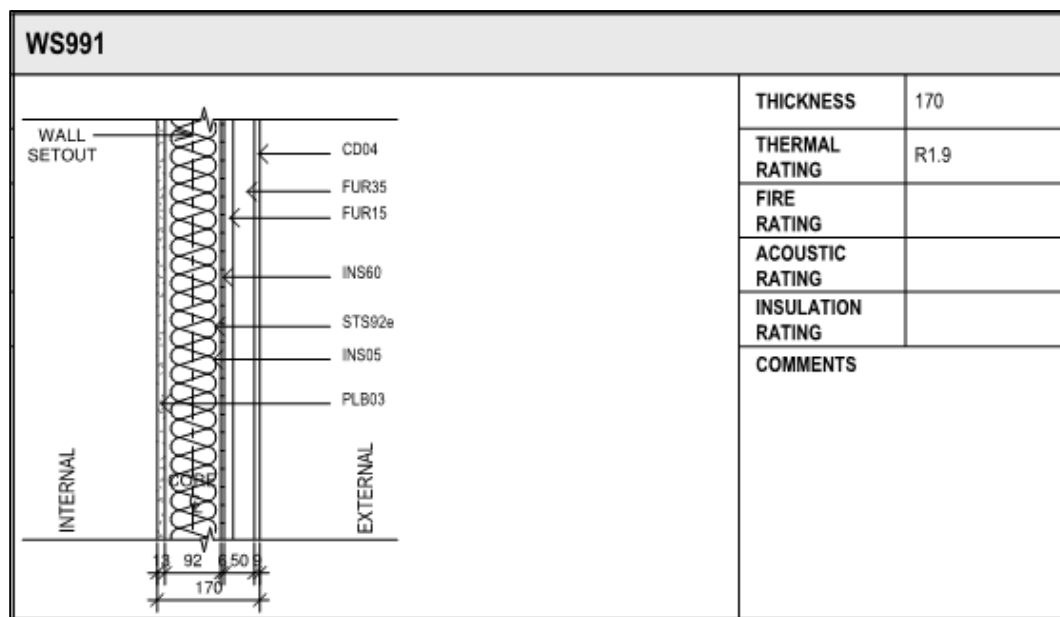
CFC Barestone CD04 : Source – Wall Type Plan M-AR-DW-8301 – Rev 6.
